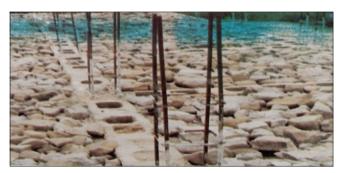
Concrete block foundation with enforcement bar and hardcore in the study area. Source: Field survey, 2023
